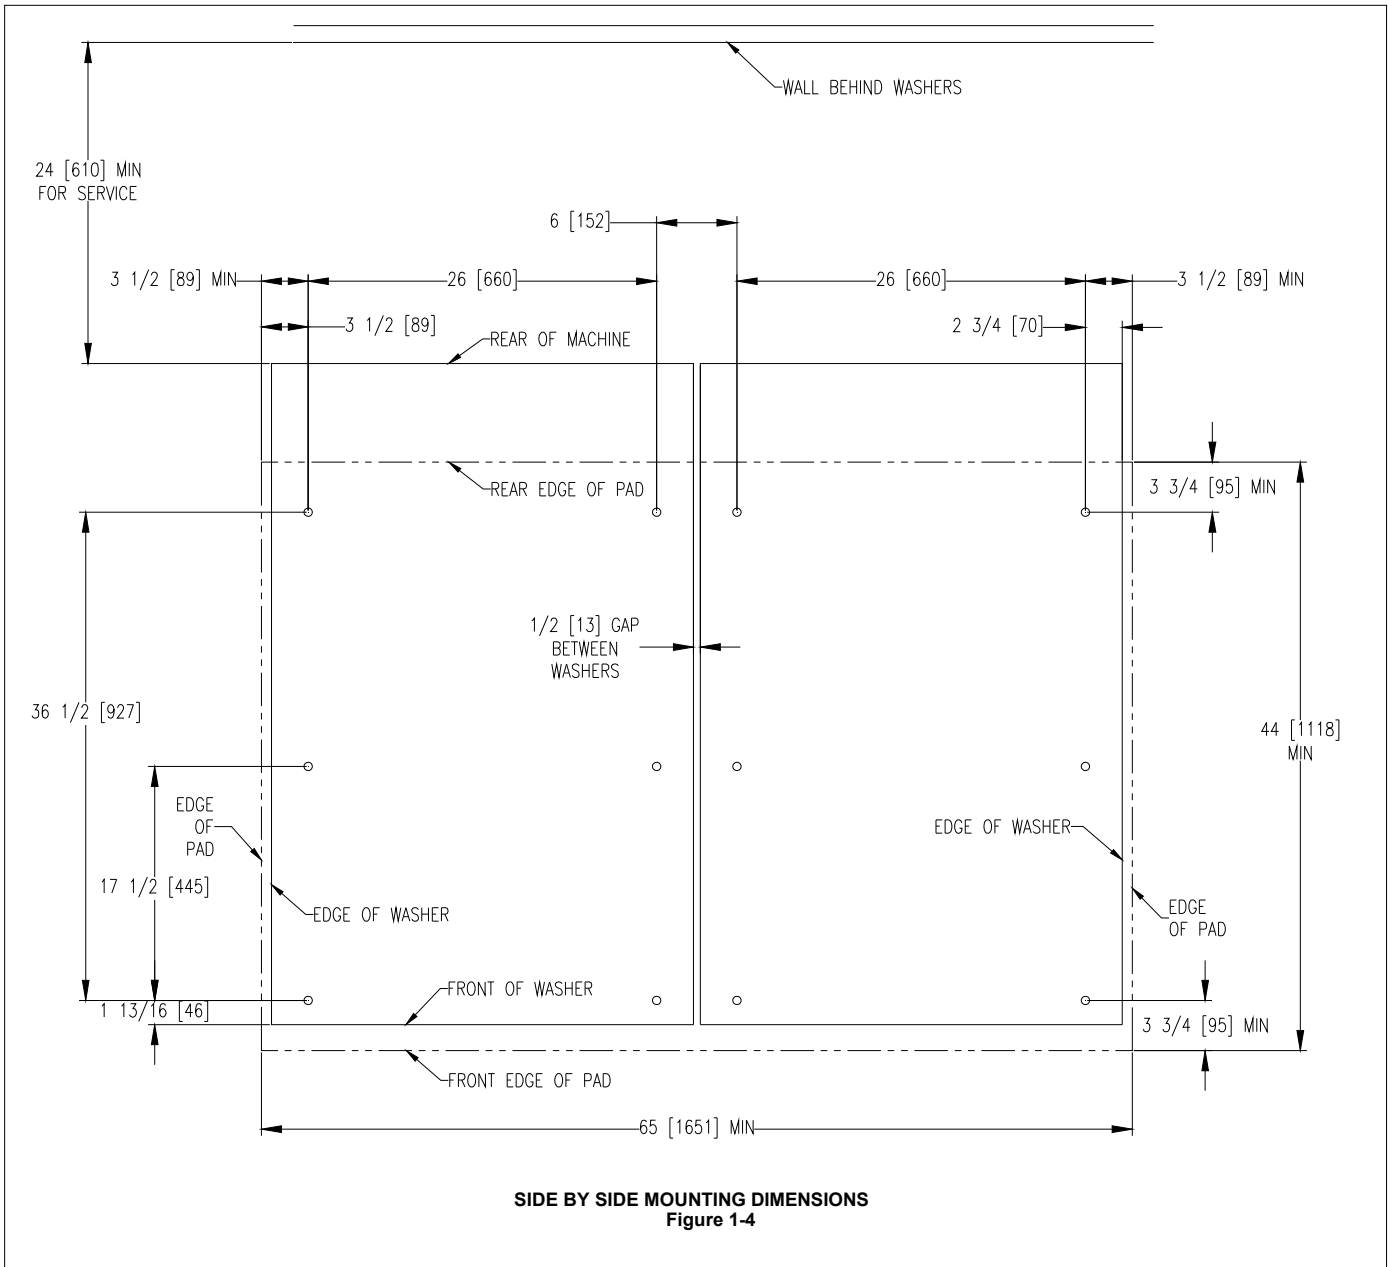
T-450 SWD Machine Side By Side Mounting Detail
